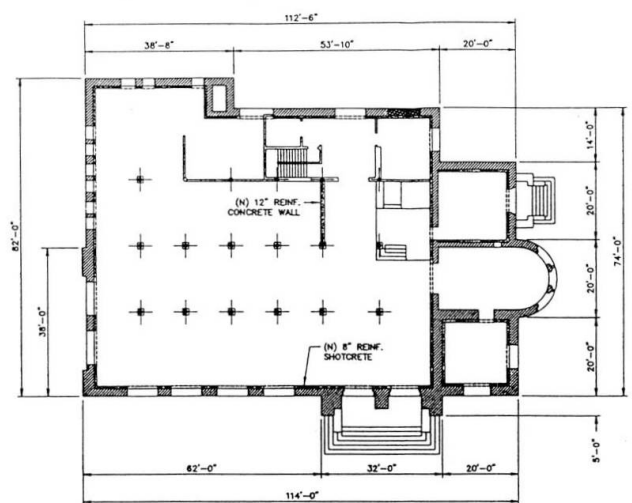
Proposed strengthening of San Jose Museum of Art - First Floor Plan.
